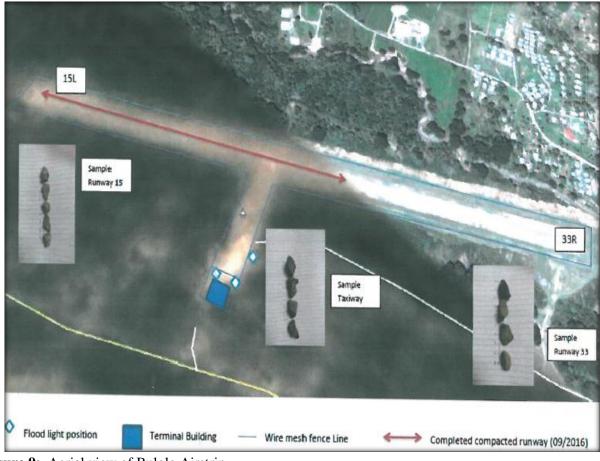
Aerial view of Bulolo Airstrip Source: LinkPNG Facility Inspection Report
